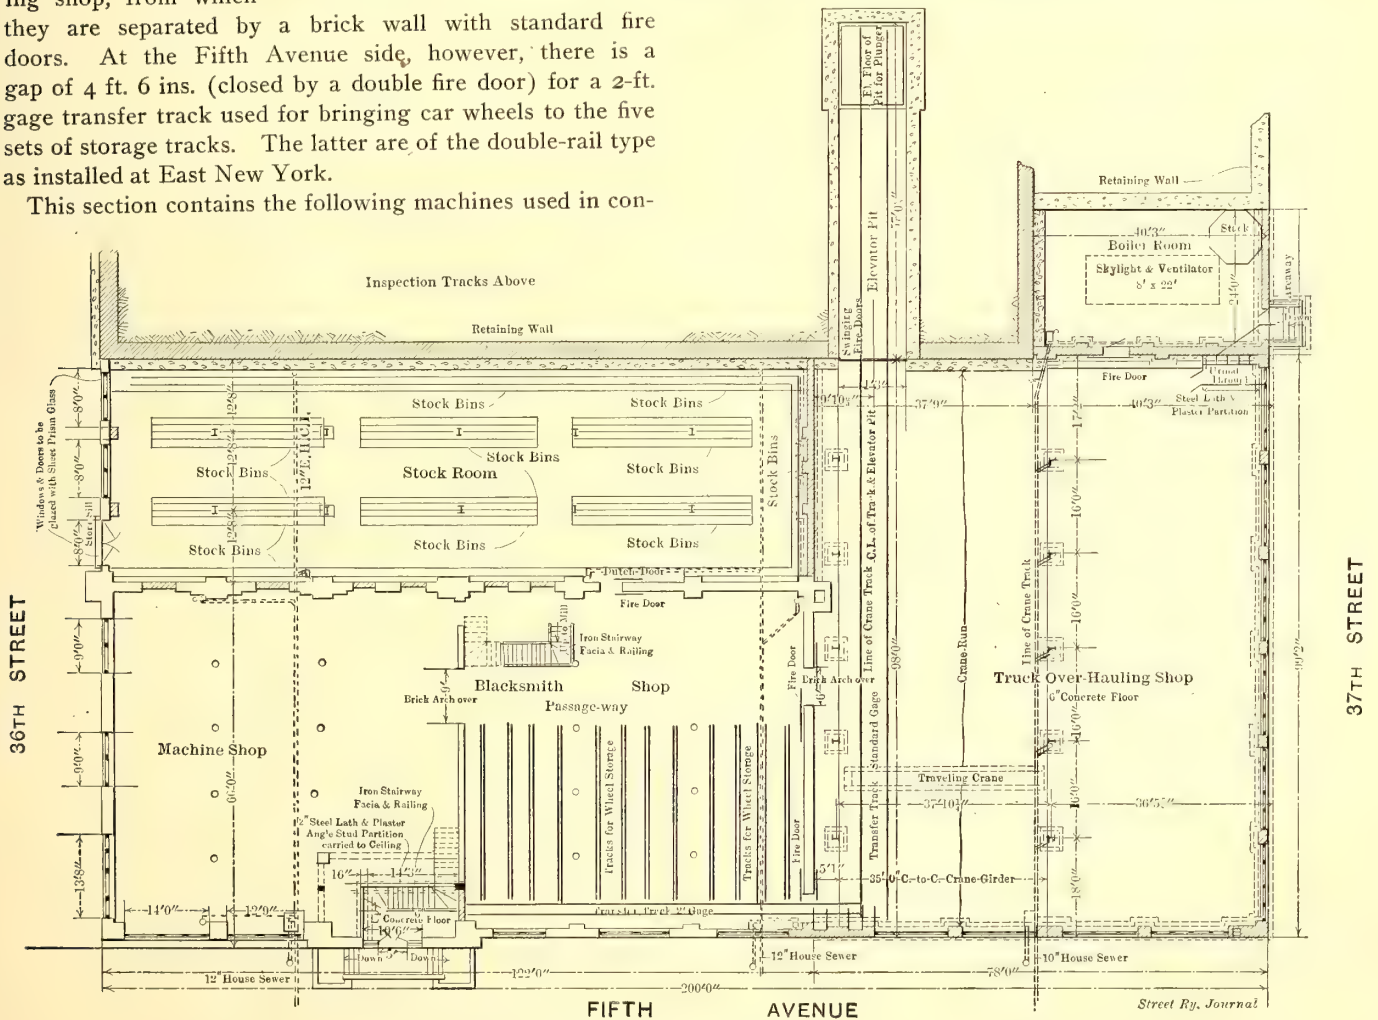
PLAN OF TRUCK-OVERHAULING SHOP AND OF THE DEPARTMENTS UNDER THE MAIN FLOOR OF THE TERMINAL BUILDING
